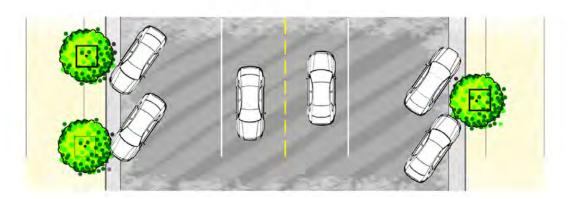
Urban Street-Angle Parking (Collector-Street Section R)
